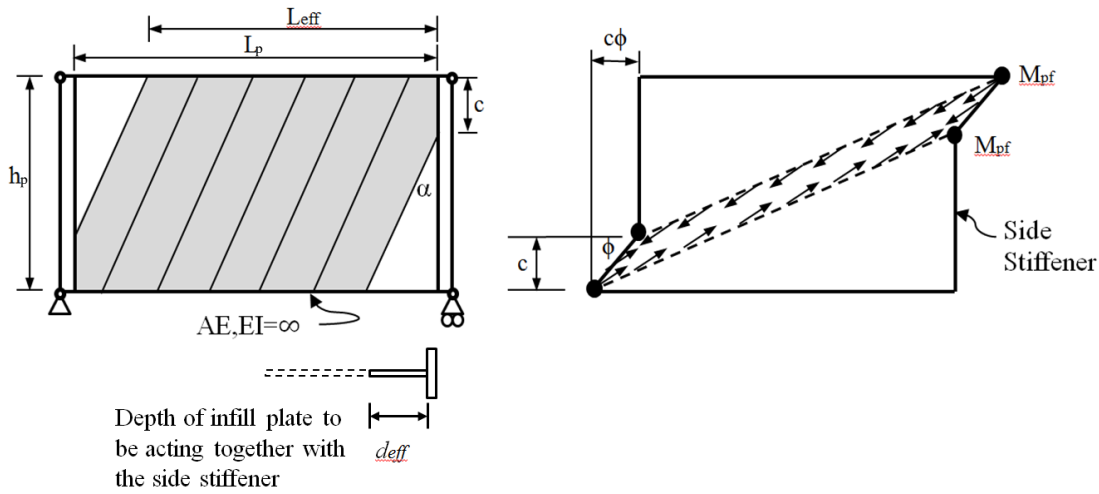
Analytical model for HPSPSW with steel shear wall connected to beam only based on the plate girder model by Evans, Porter, and Rockey (1978, 1987)
